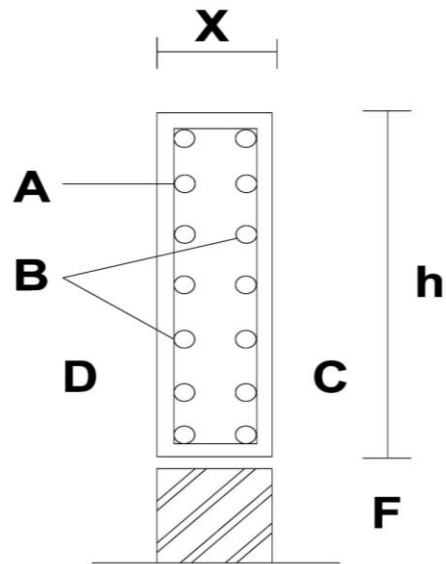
R.C.R.W type (or Alt.) 01 Section
